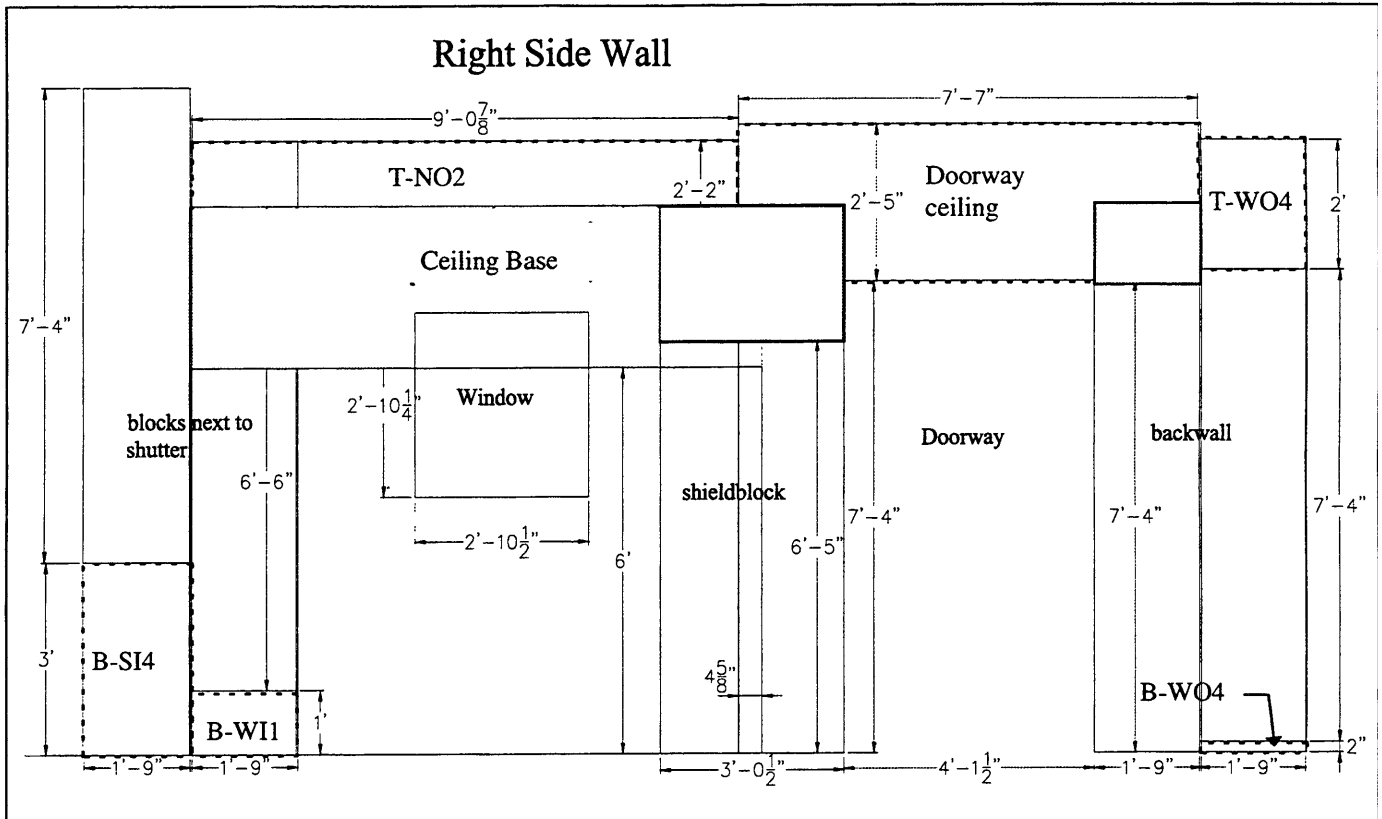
View of right side wall, showing spacer blocks(dotted lines) that house a portion of the shielded window, the ventilation entrance duct and possible exit duct.
